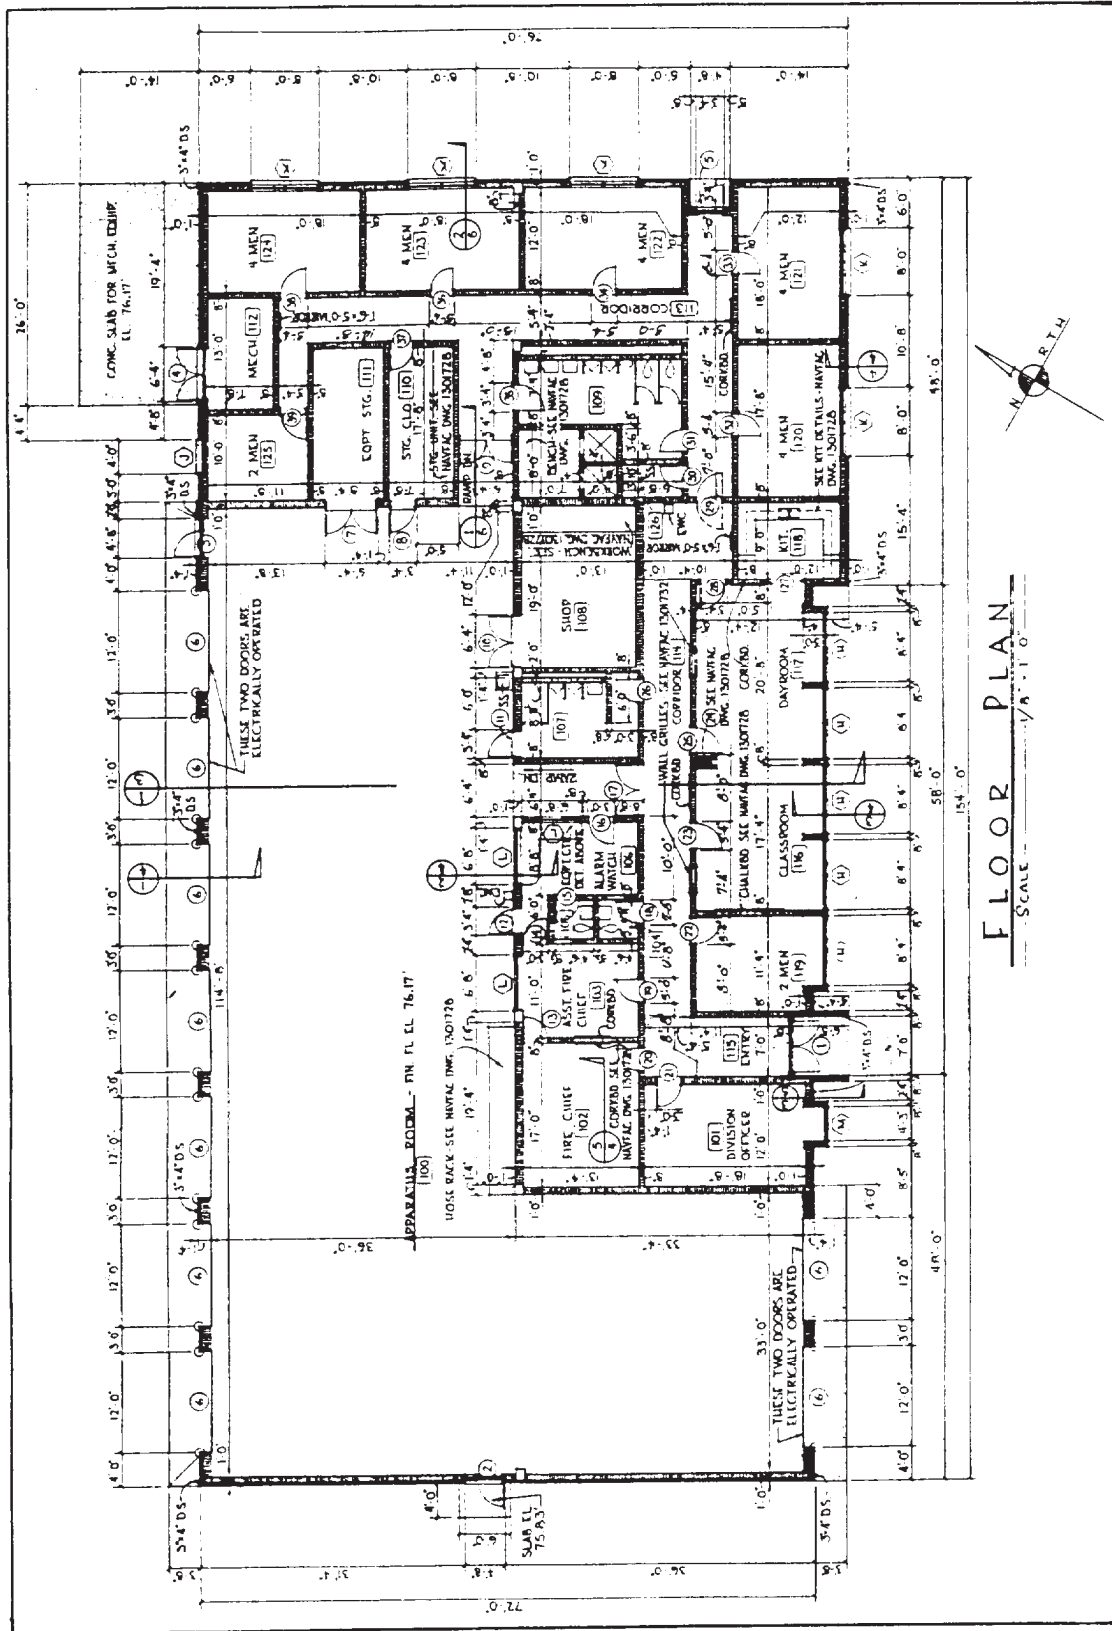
Example of a floor plan for a concrete-masonry construction.
